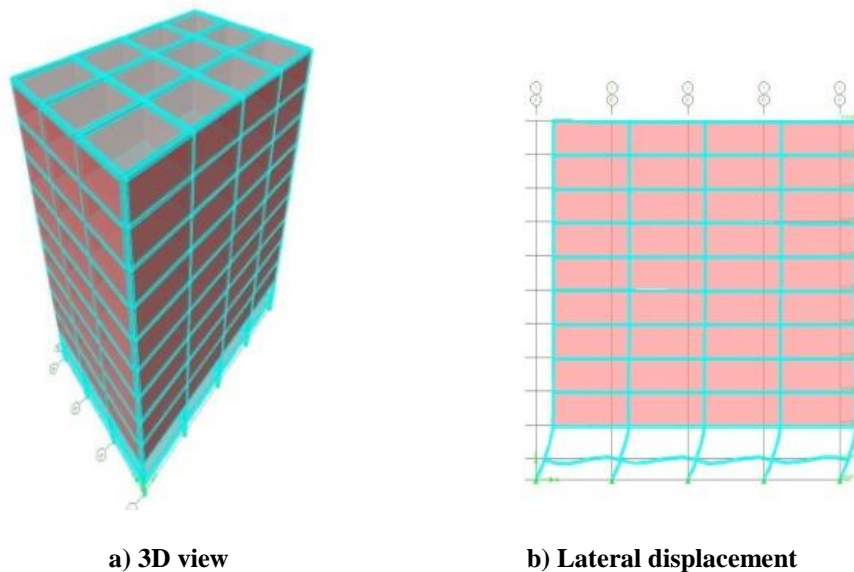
Model 5: G+10 RC two soft storey building with slab element
